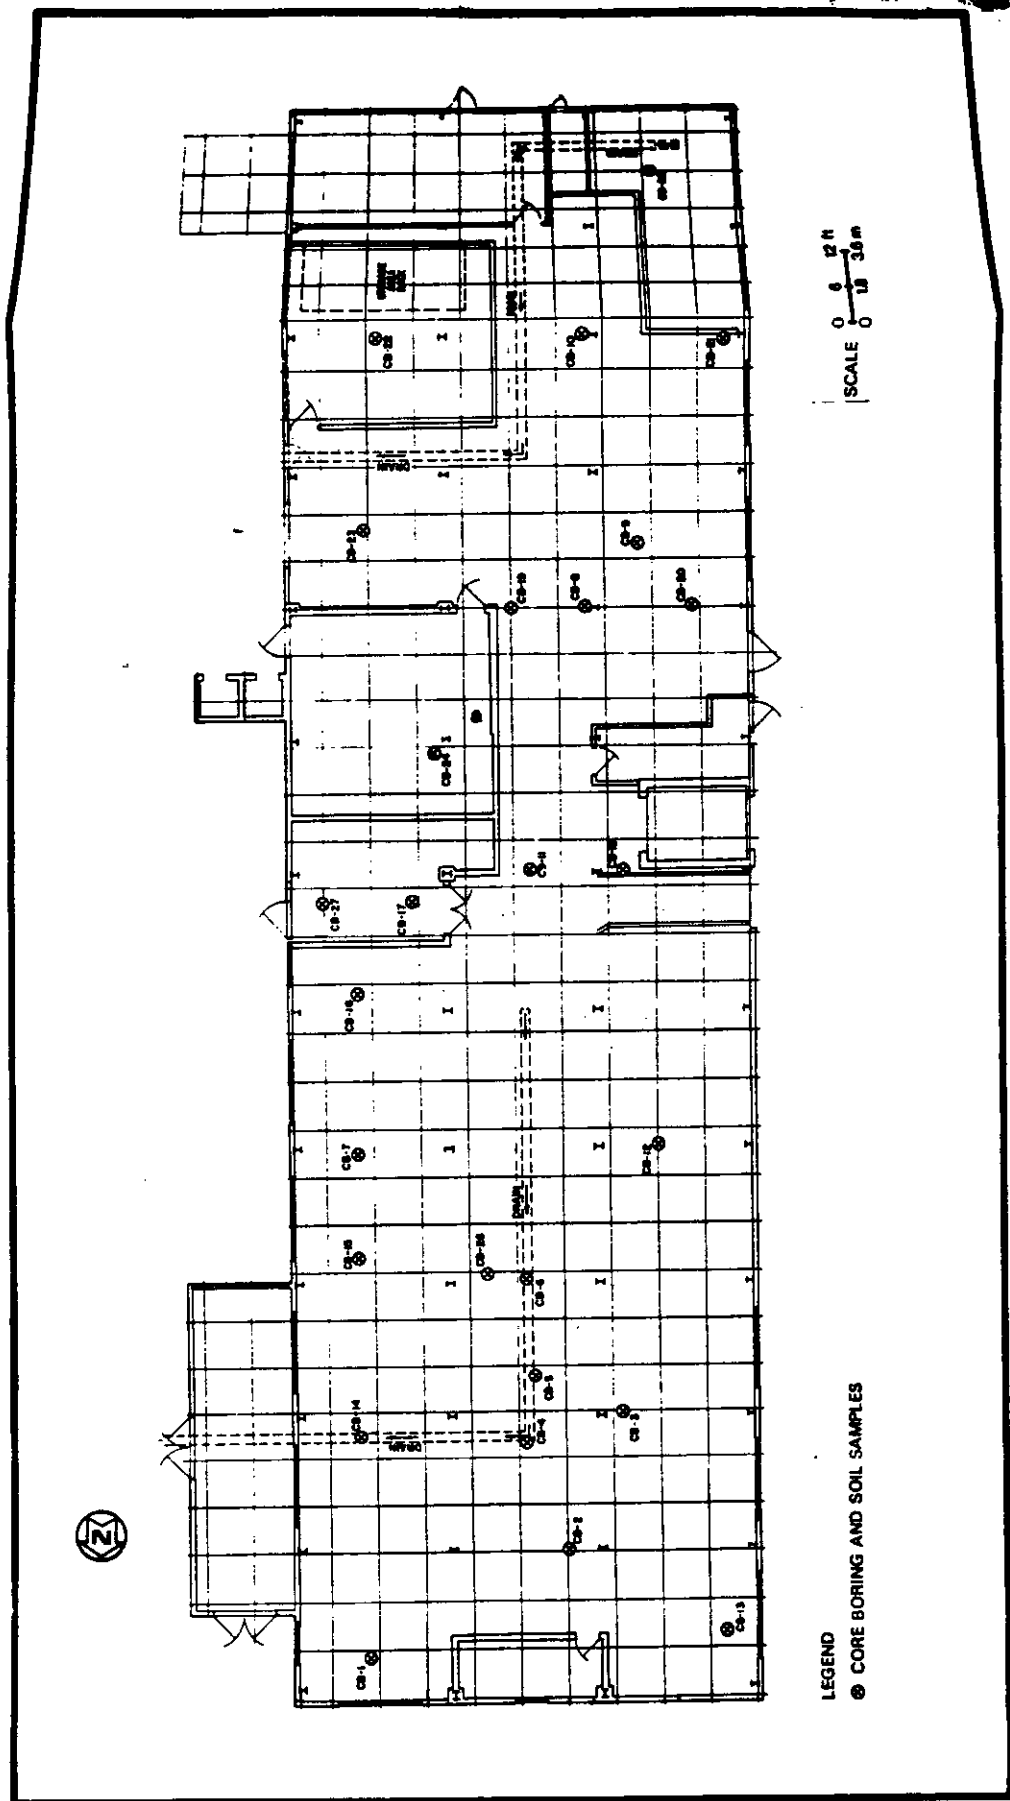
CORE BORINGS AND SOIL SAMPLE LOCATIONS, BUILDING 845 (GROUND FLOOR)
